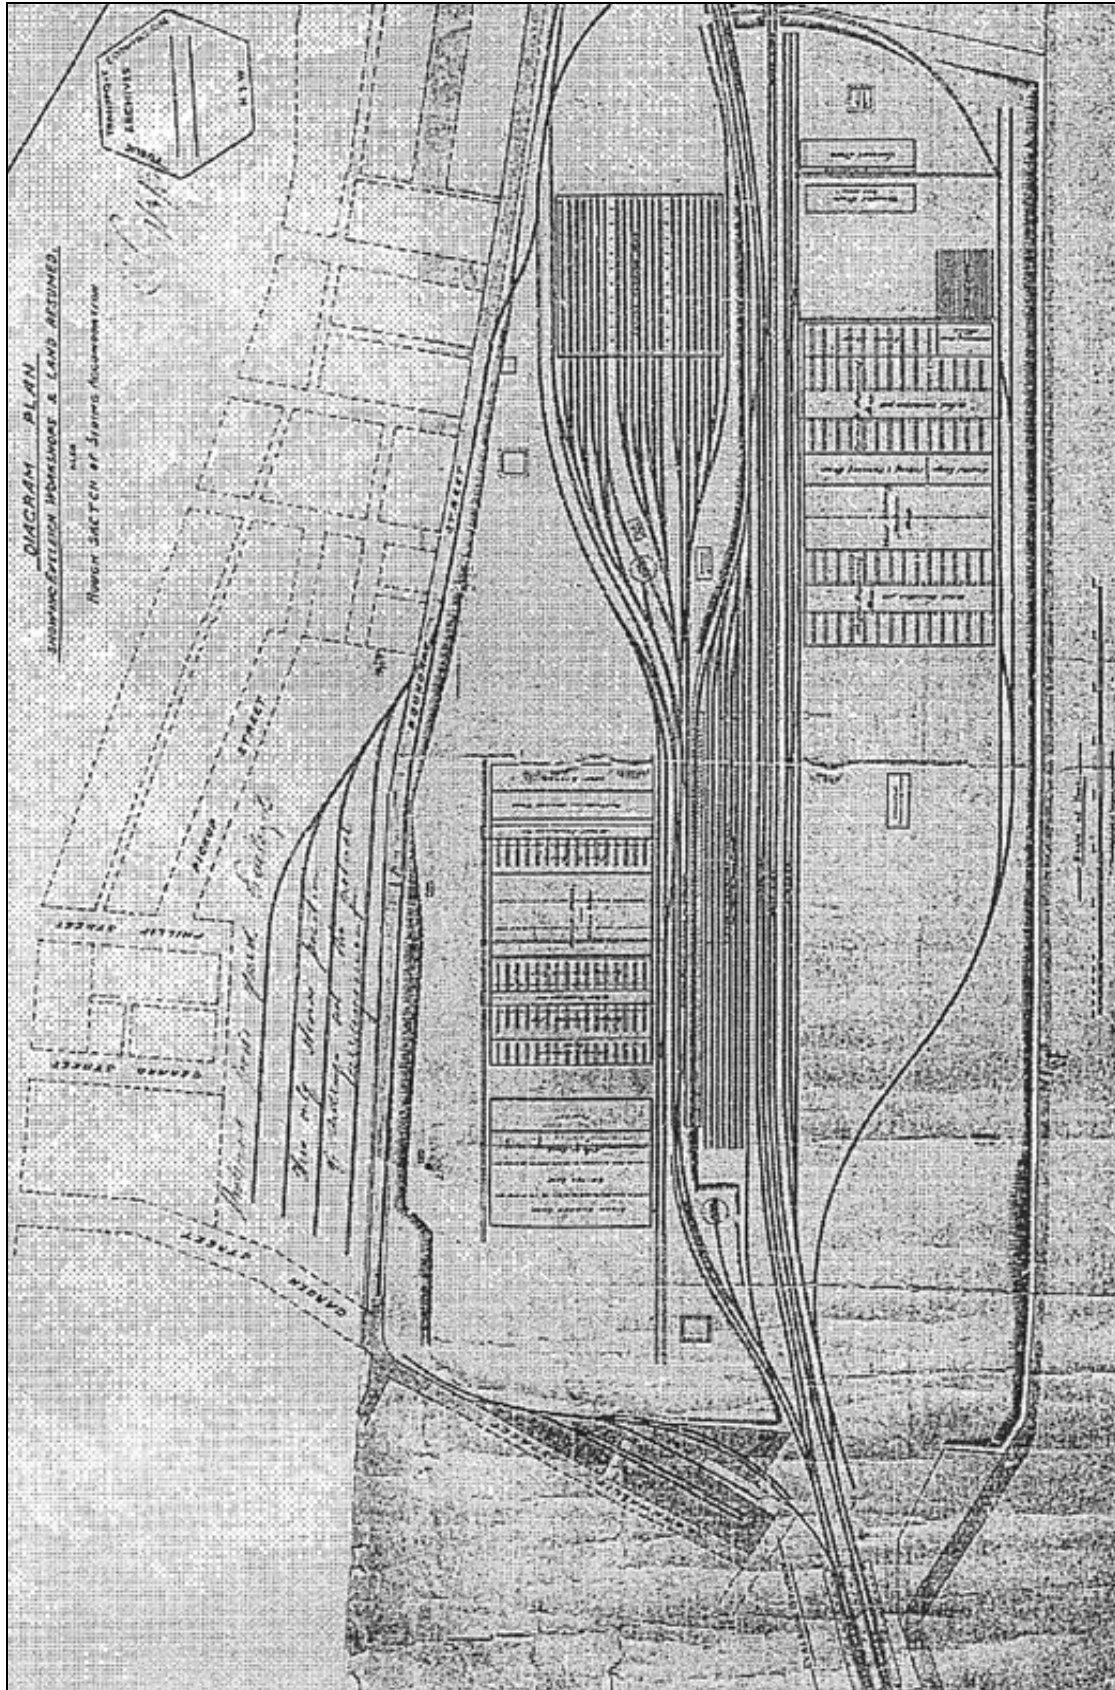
Plan of Eveleigh Carriage and Wagon Workshops, c.1889. Plan shows the Carriage and Wagon Workshops, the Pain Shop as built, and the Chief Engineer's office.
